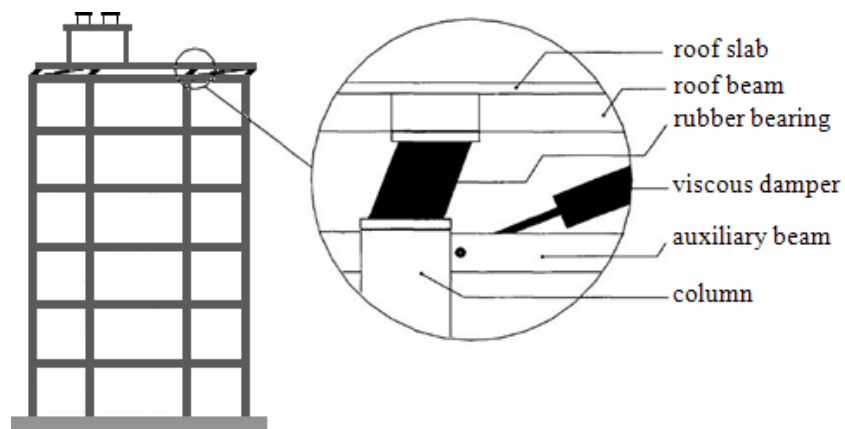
Building with roof isolation (Villaverde 1998)
